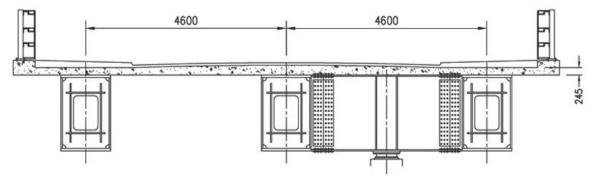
Composite Box Girder Bridge with rectangular steel box sections
